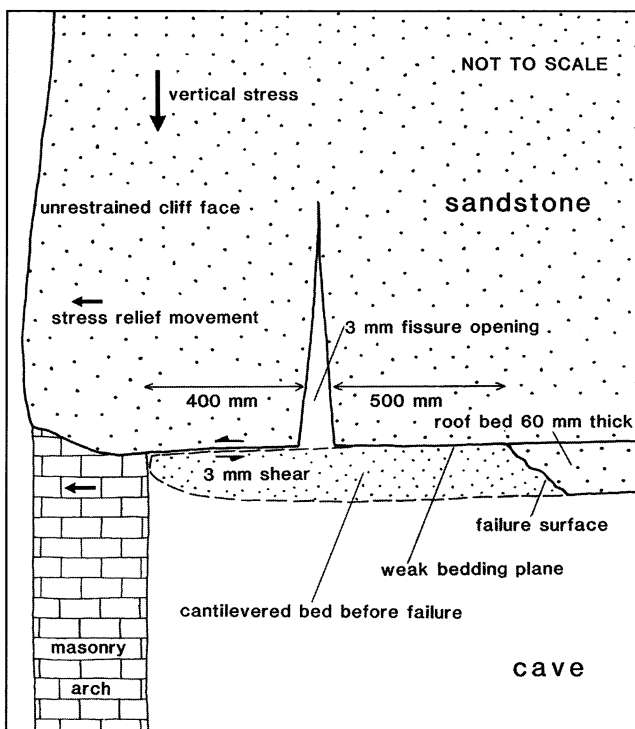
Diagrammatic cross section of the failure of the sandstone bed which forms the roof in the cave behind the Brewhouse Yard Museum.
